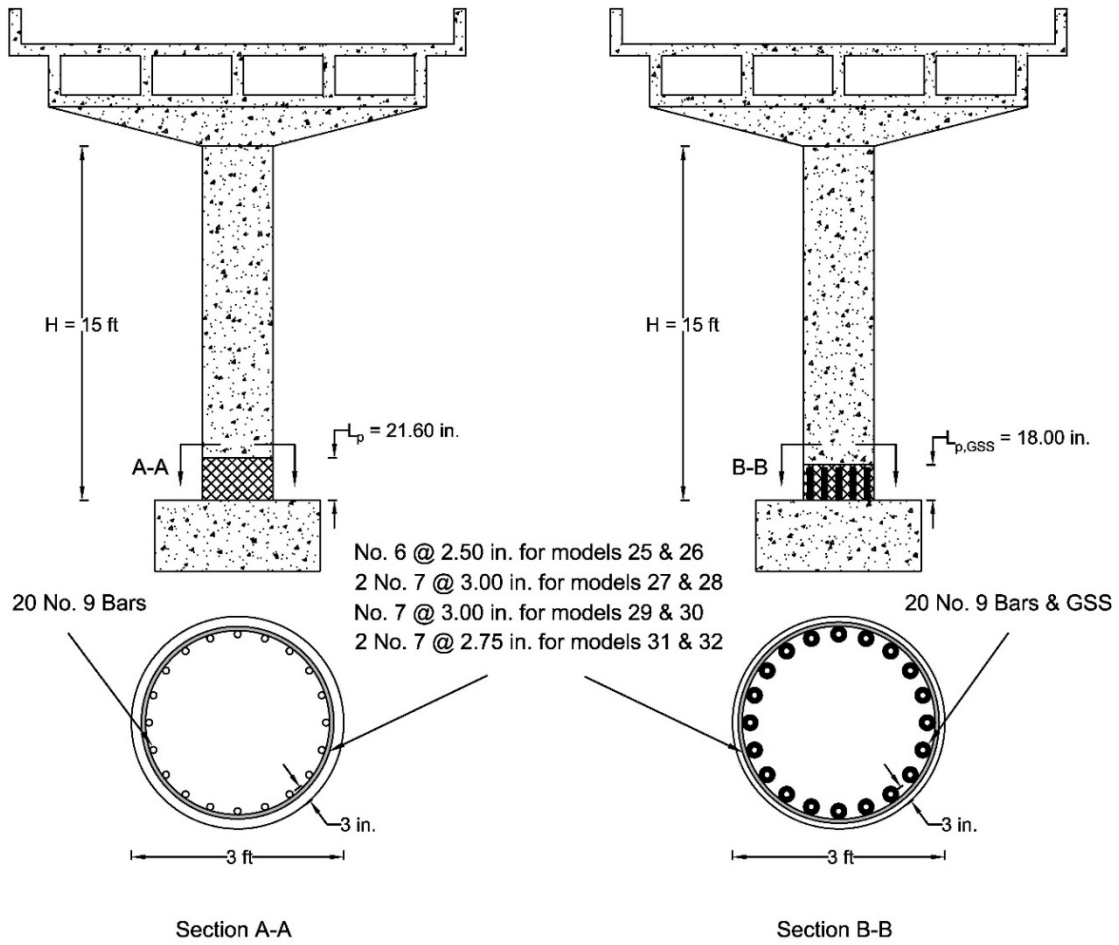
Details of column models with $H = 15$ ft and 20 No. 9 bars.
